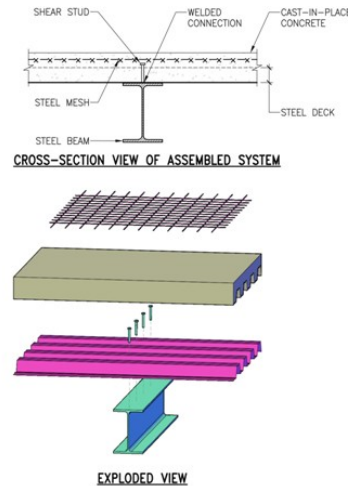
Conventional composite framing materials including steel mesh, steel headed stud anchors, concrete, and steel deck are not reusable; steel headed stud anchors must be removed prior to beam reuse.
